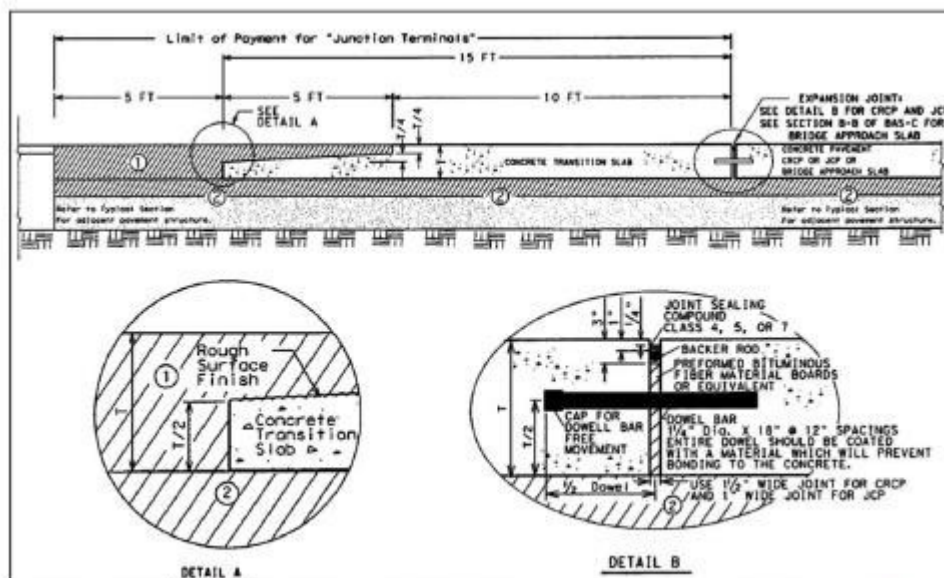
Transition between Flexible Pavement and Concrete Pavement (6).
